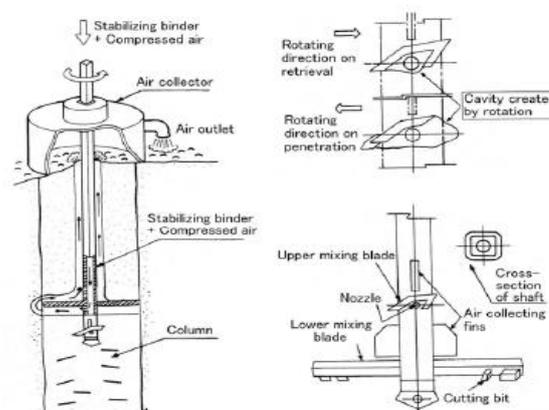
Schematic diagram of construction principle and structure of mixing blade
